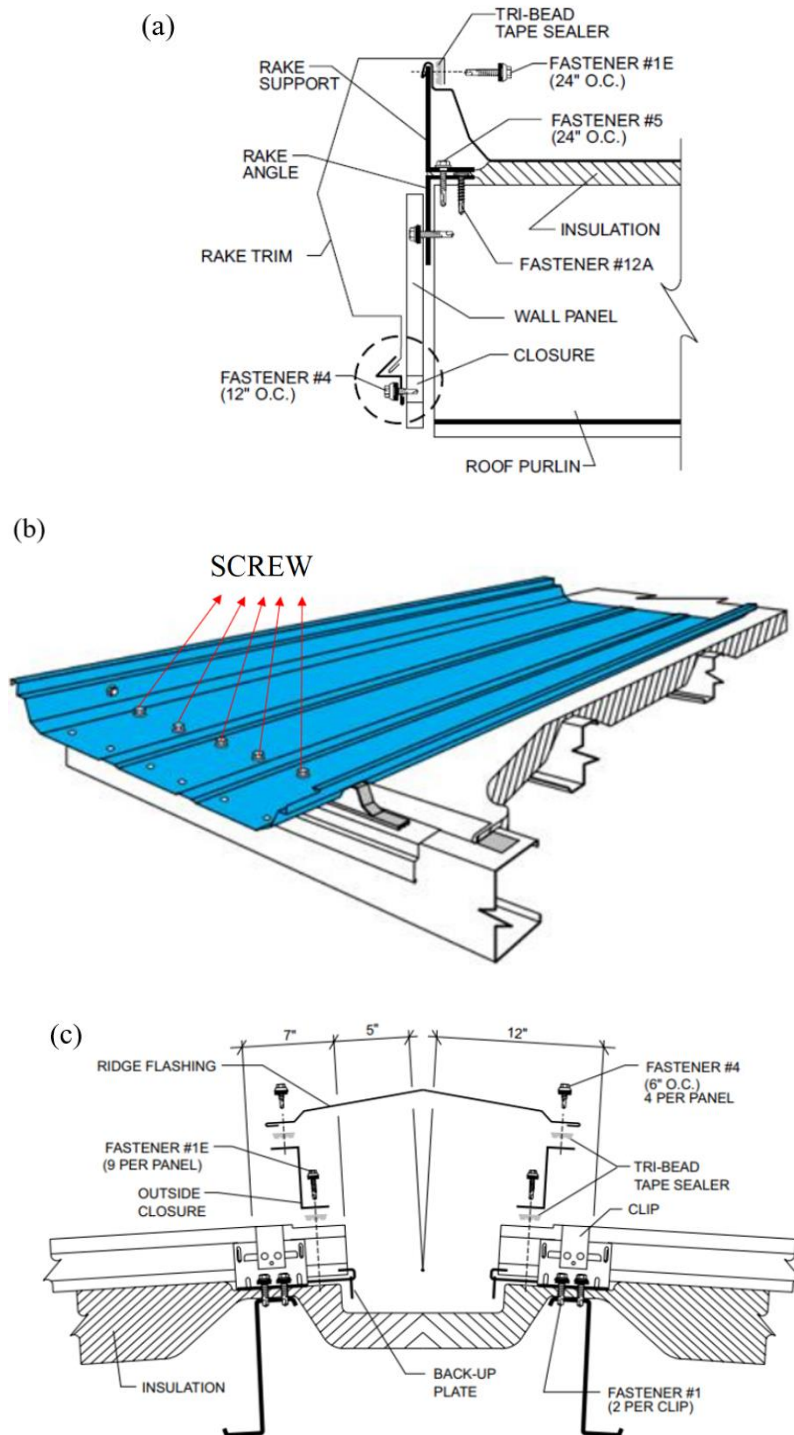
Cross-section of roof panel (Unit: mm)
